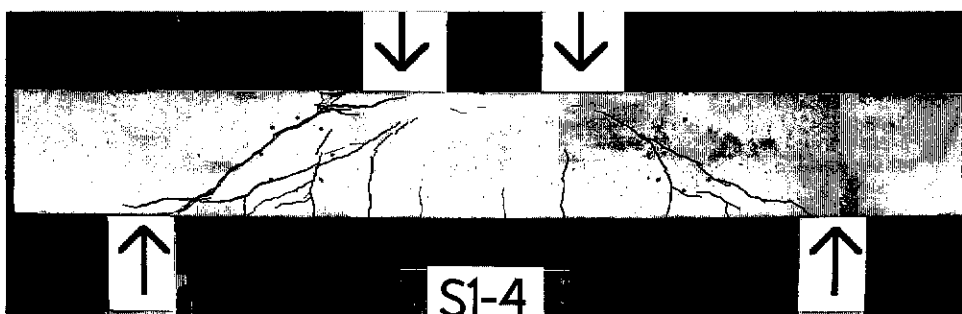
Crack Pattern of the Back Face of Beam S1-4
